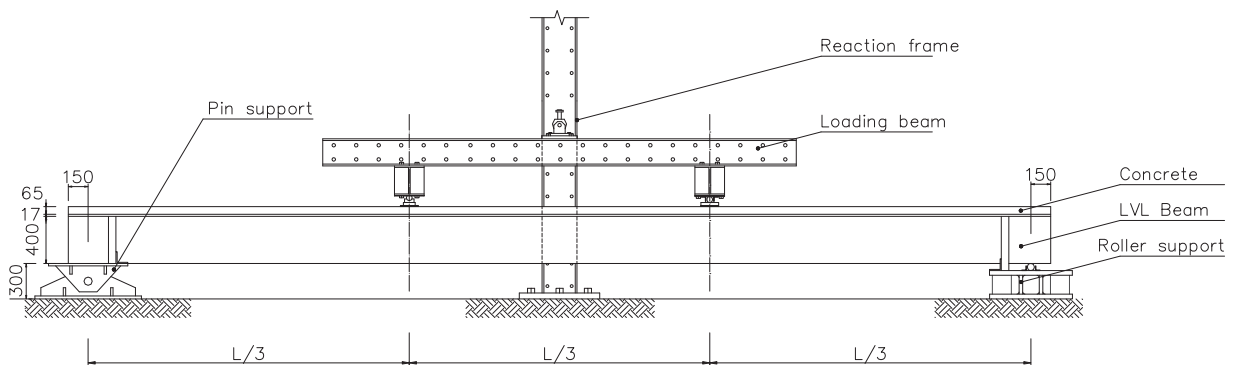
Four-point bending test setup for collapse test of TCC beams (dimensions in mm).
